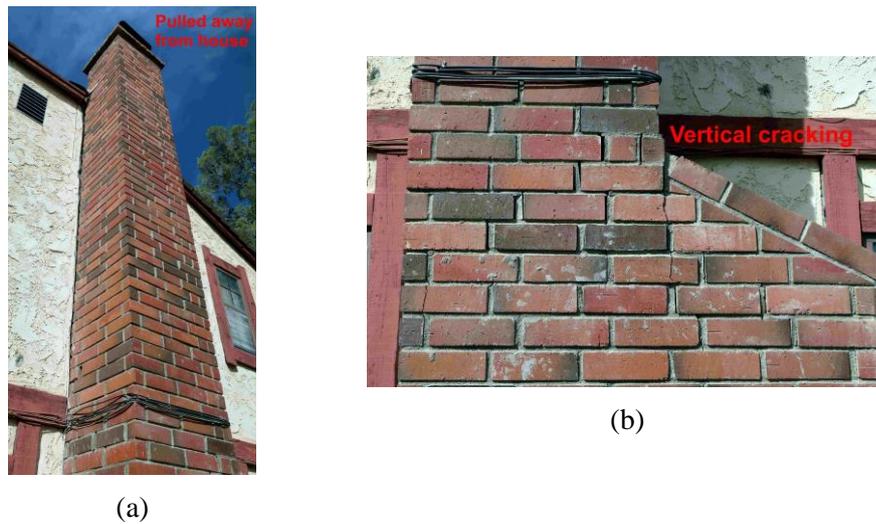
Example of Ridgecrest masonry chimney that pulled away from home likely from deficient anchoring to home at floor and roof levels.
